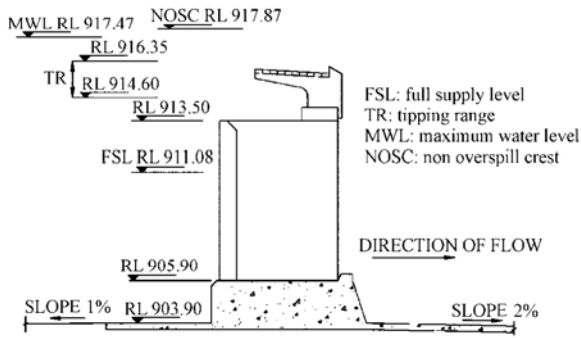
Jindadyne dam typical cross section through the spillway with key elevation
